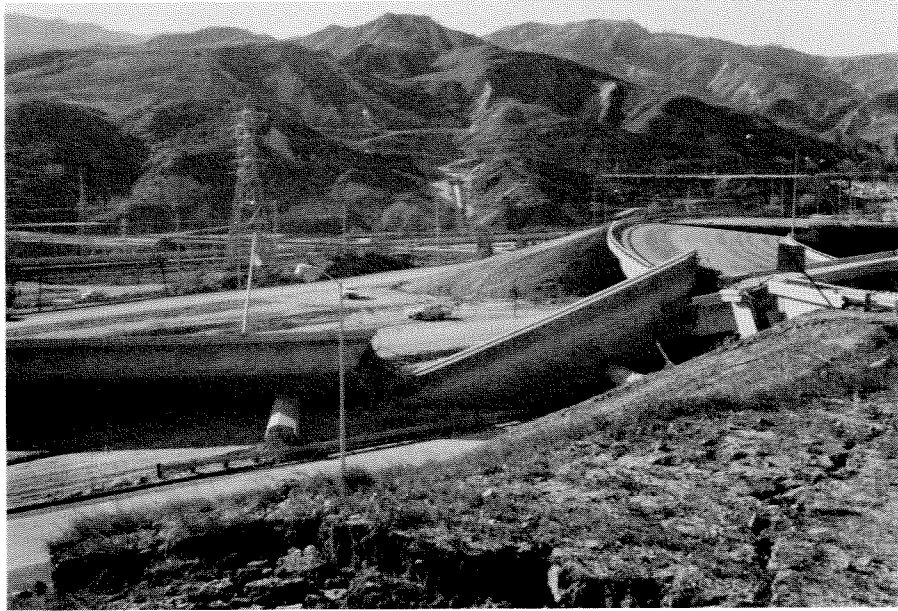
Overturned freeway overpass at intersection of Foothill and Golden State freeways. Overpass column reinforcing has pulled out of foundation. Partial slope failure seen in embankment fill in foreground.
